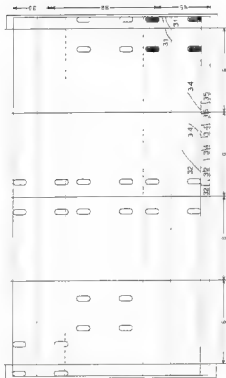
Top Cracking Pattern (Fifth Bridge - Test No 6)
